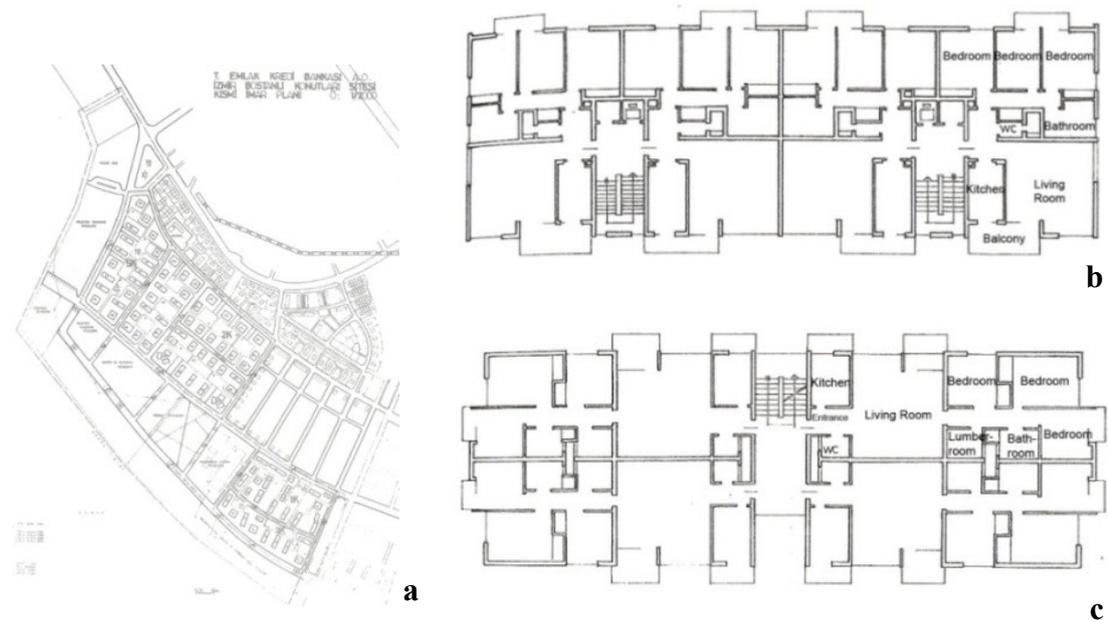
Bostanlı Mass-Housing, Izmir, 1956: a. Site plan; b. P2-type floor plan; c. P3-type floor plan (Sources: a. Koç 2001, 137; b., c. Koç 2001, 136)
